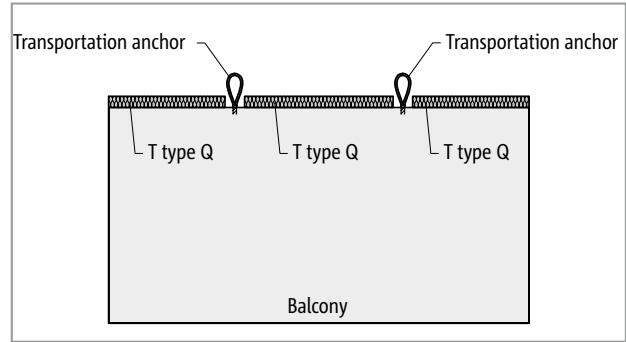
Schöck Isokorb® T type Q: Precast balcony with transporter anchor; insulation spacer T type Z can be inserted on-site
